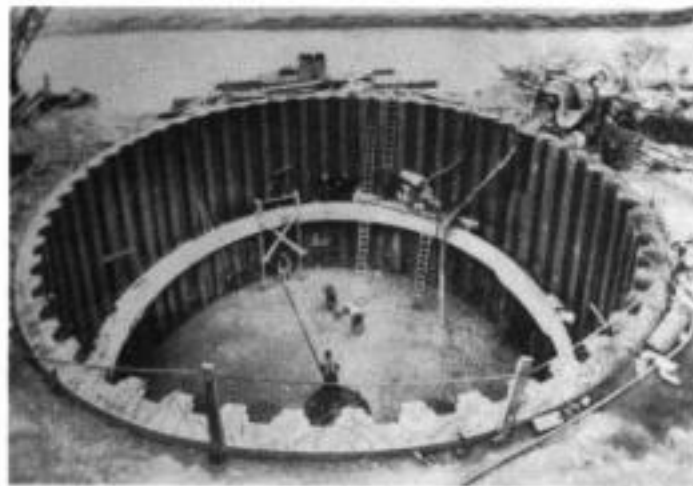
Circular cofferdam with reinforced concrete ring walings, outer waling uppermost, inner waling above formation level
